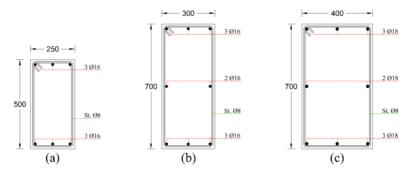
Upper story columns: a) 3-story column, b) 7-story column, c) 7-story column (units in mm)
